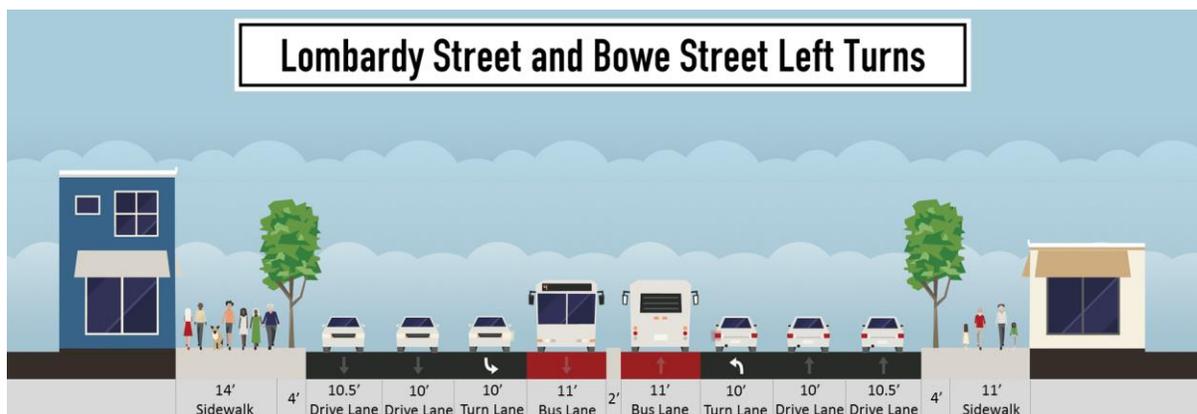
The cross-section of Broad Street at Lombardy Street if an exclusive left-turn lane is installed. Note lanes are at minimum require widths and sidewalk space must be acquired on one side of the roadway.
